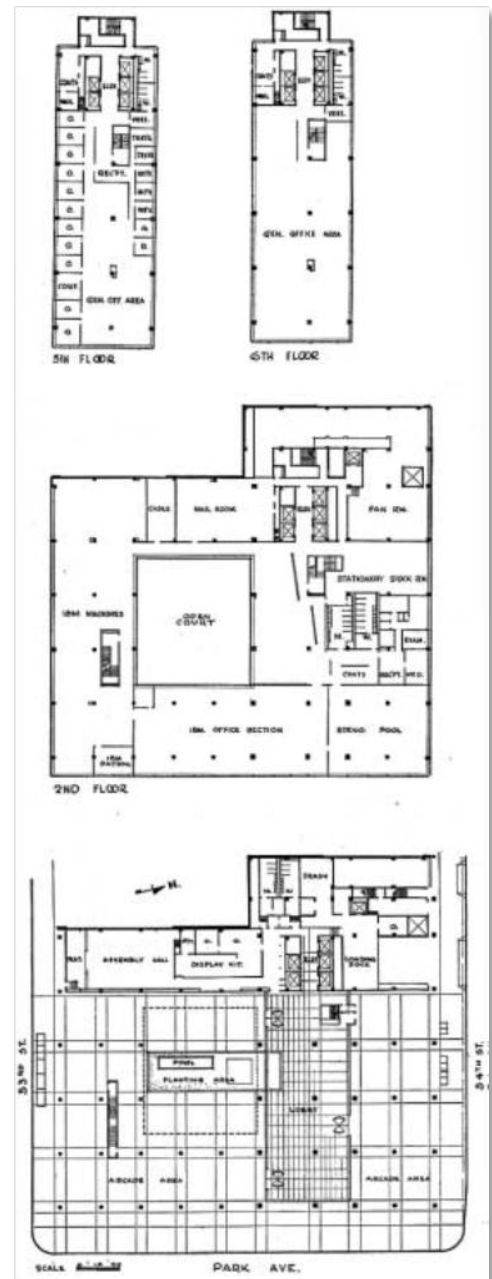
LEVER HOUSE, FLOOR PLANS
